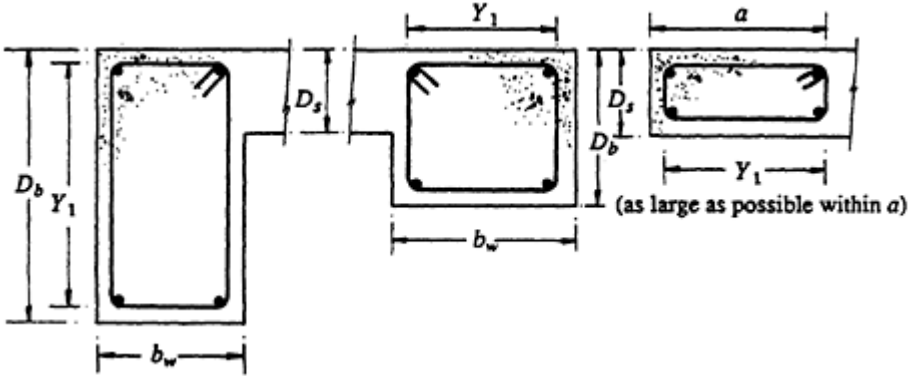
Shear reinforcement details and dimensions for slabs (from AS 3600–1988).
